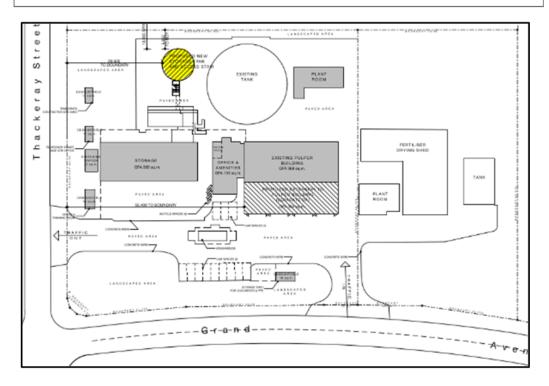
Proposed layout of the site with the new biomass storage tank highlighted in yellow (Source. extracted from the submitted plans).
